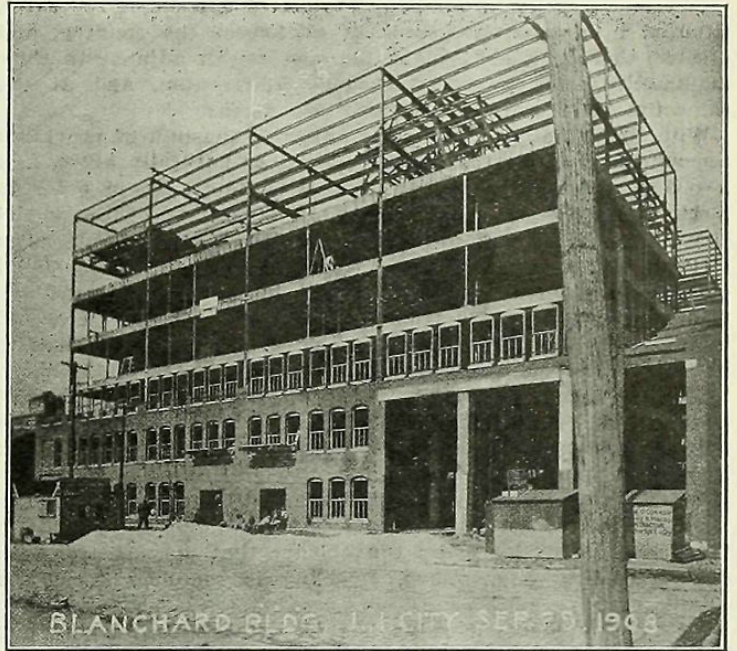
BORDEN AV. FRONT OF STRUCTURE, SHOWING WORK IN PROGRESS ON THREE FLOORS.
